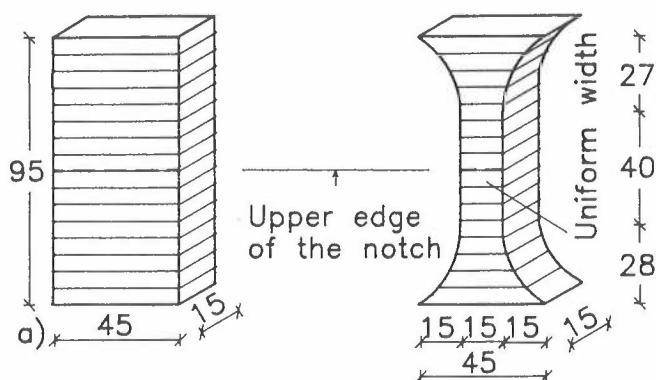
Narrow tension test specimen. a) Geometry after sawing, b) Final geometry.
